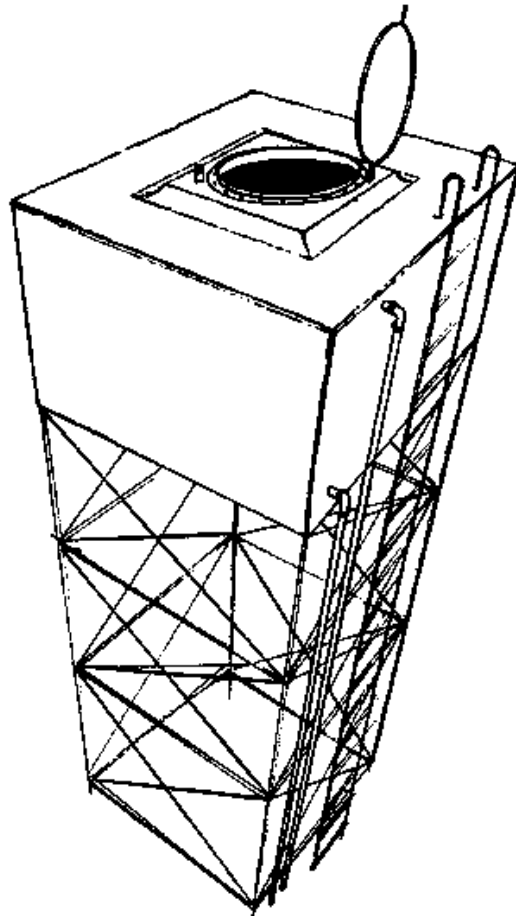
Elevated storage tanks should have a tight-fitting lid.
